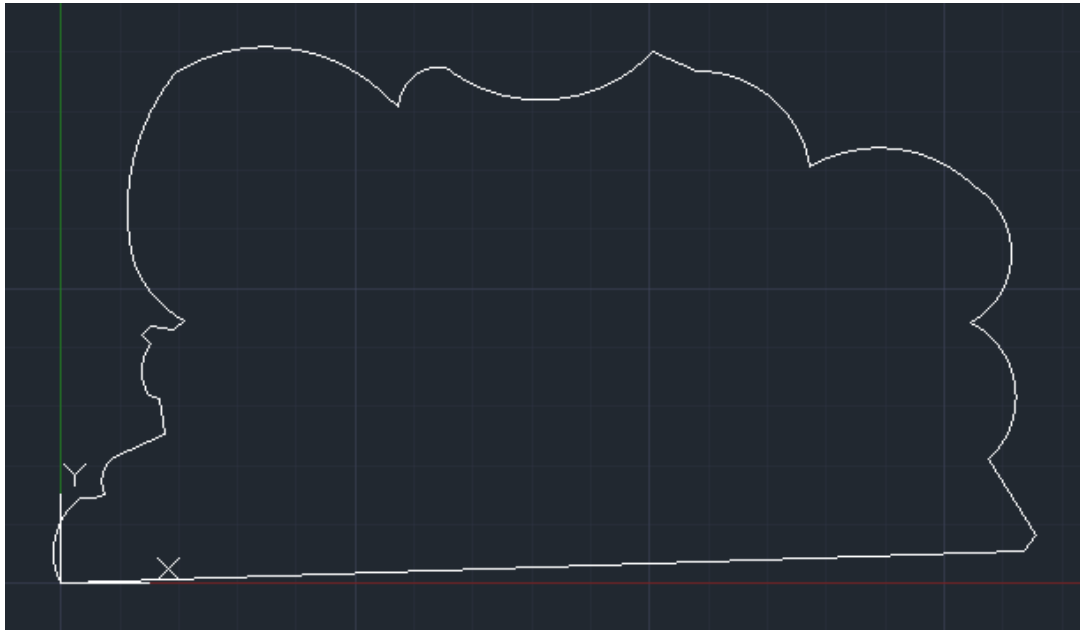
AutoCAD Outline of Printed Beam Cross Section
